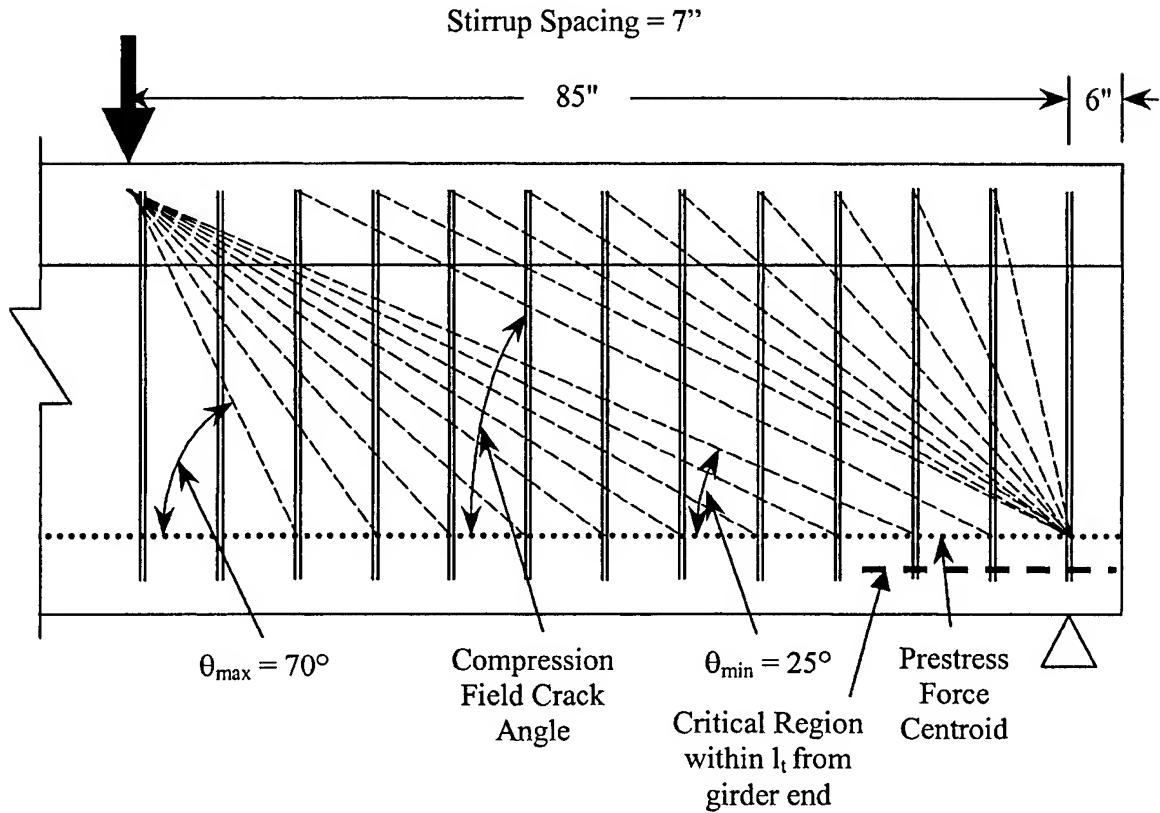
Variable Angle Truss Model for Girder Test G1C-West
